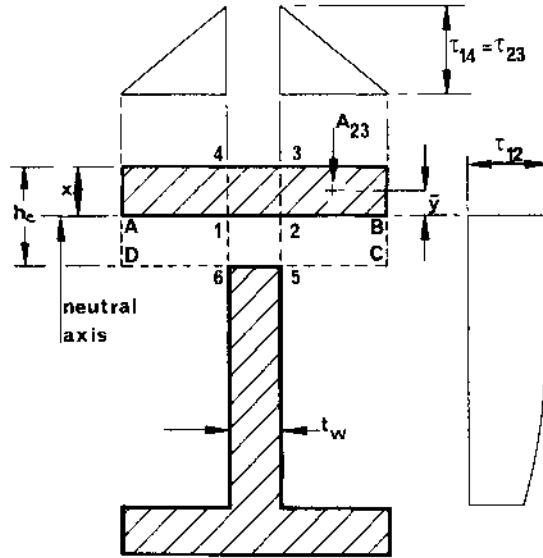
Shear stresses in a composite section with the neutral axis in the concrete slab
